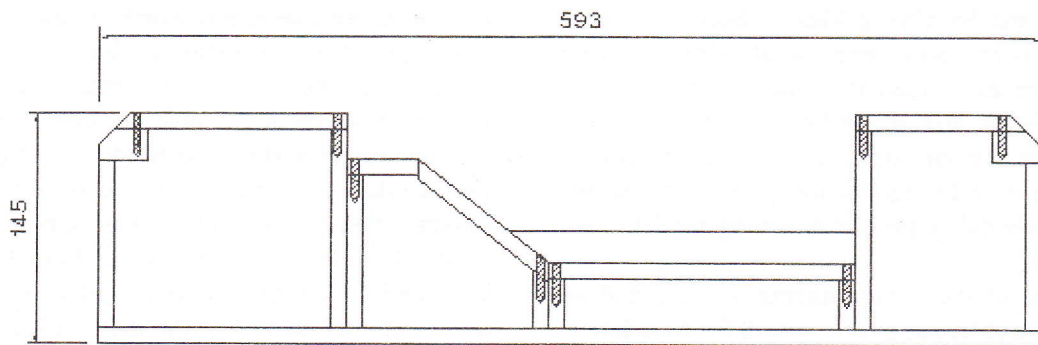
Typical cross section of the model foundation caisson for the gates
